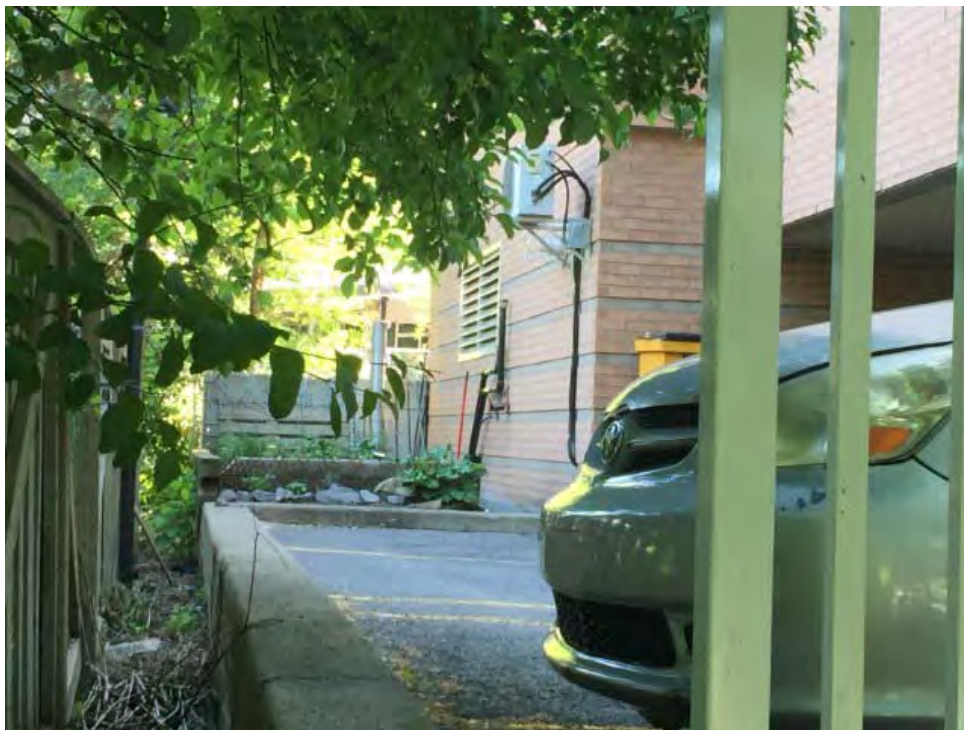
Fill and vent pipes for a fuel AST associated with a generator that were observed in the northern exterior wall of the residential building located immediately south of the Site (108 New Orchard Avenue).
